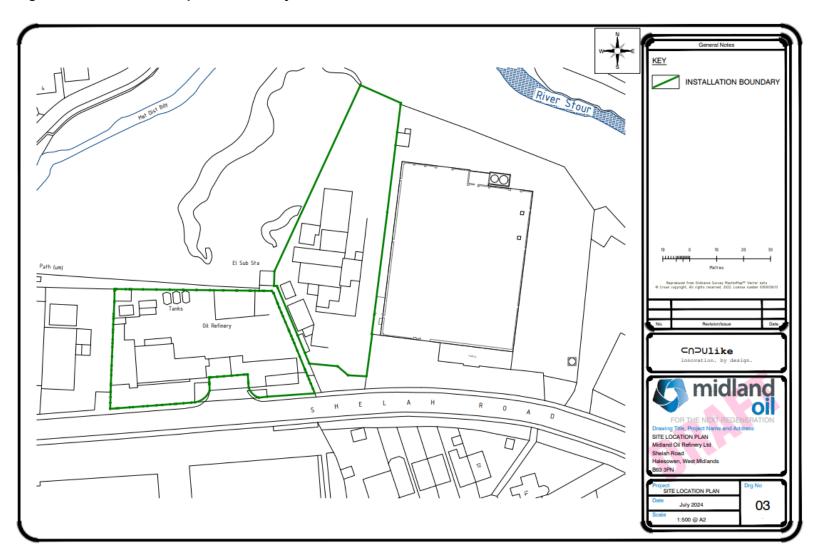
Site Layout Plan including emission points (Site A – Midland Oil Refinery)
